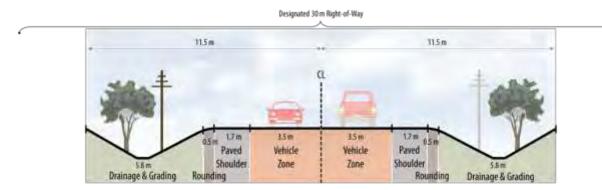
11.4 m Platform Rural Cross-Section for Winston Churchill Boulevard
